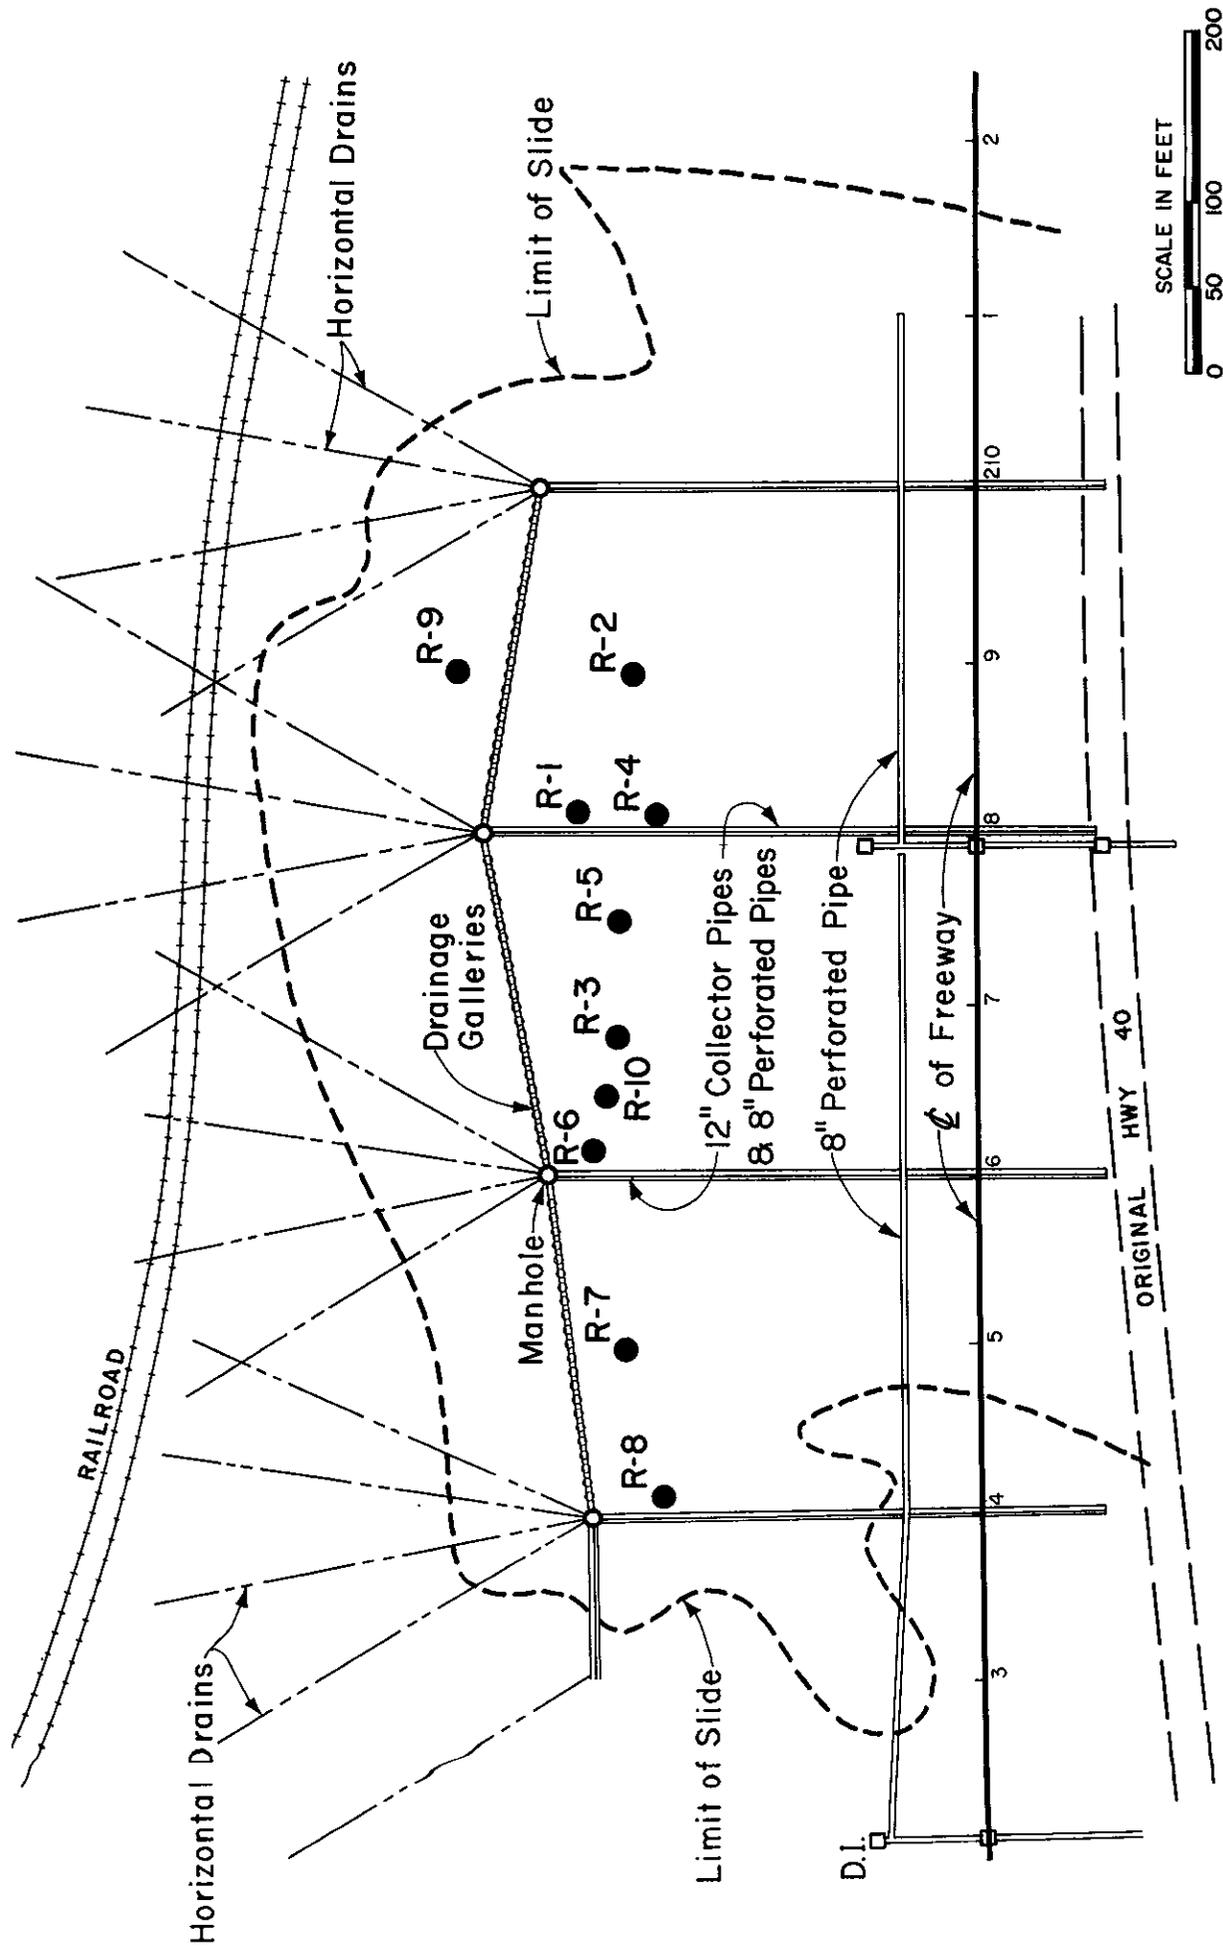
PLAN SHOWING STABILIZATION DETAILS AND BORING LOCATIONS AT TOWLE SLIDE
